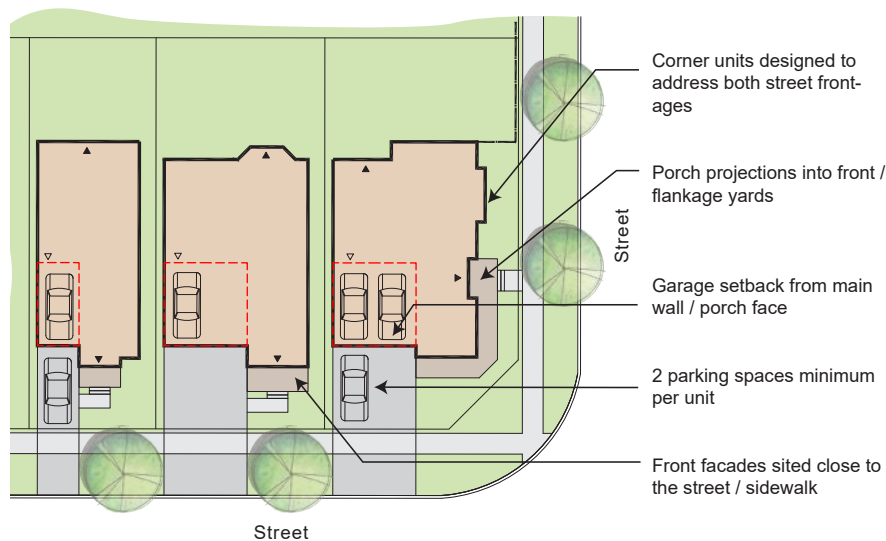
Conceptual plan layout for single detached dwellings
